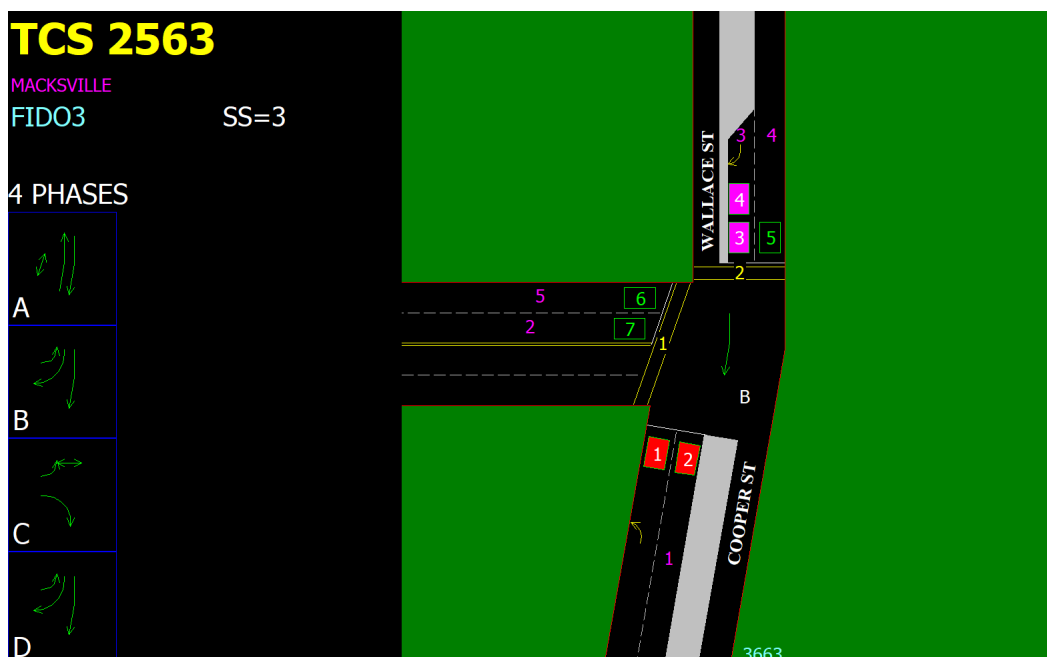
Intersection of Giinagay Way Road and Wallace Street signal phasing
